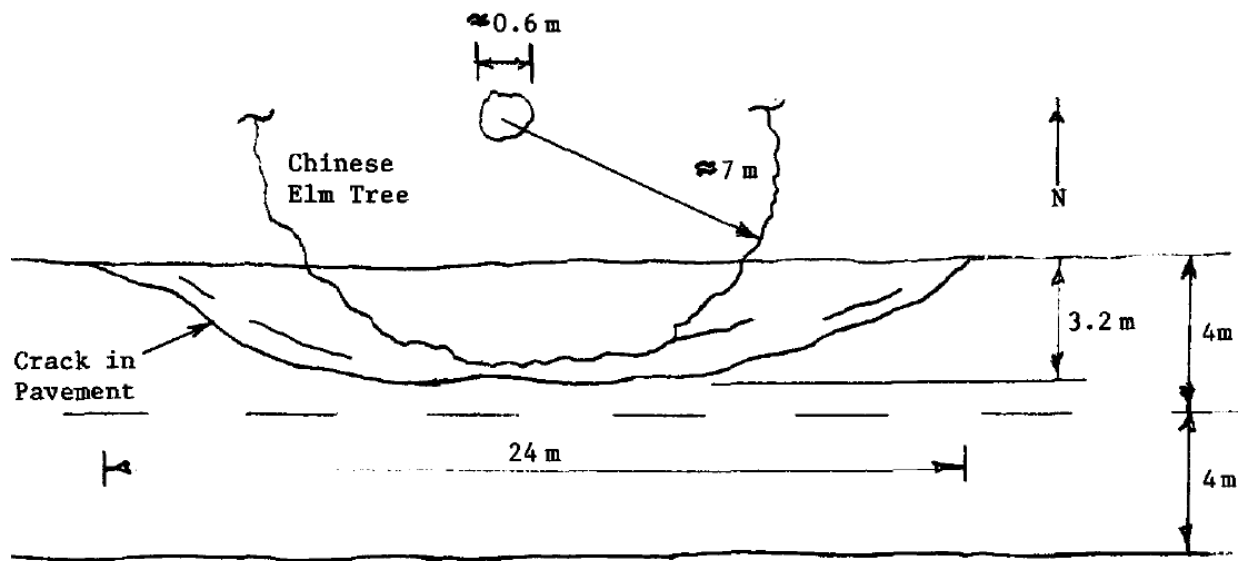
Arc-shaped Cracks in HMA Pavement Along 32nd Street, Stillwater, OK (Snethen 2001)
